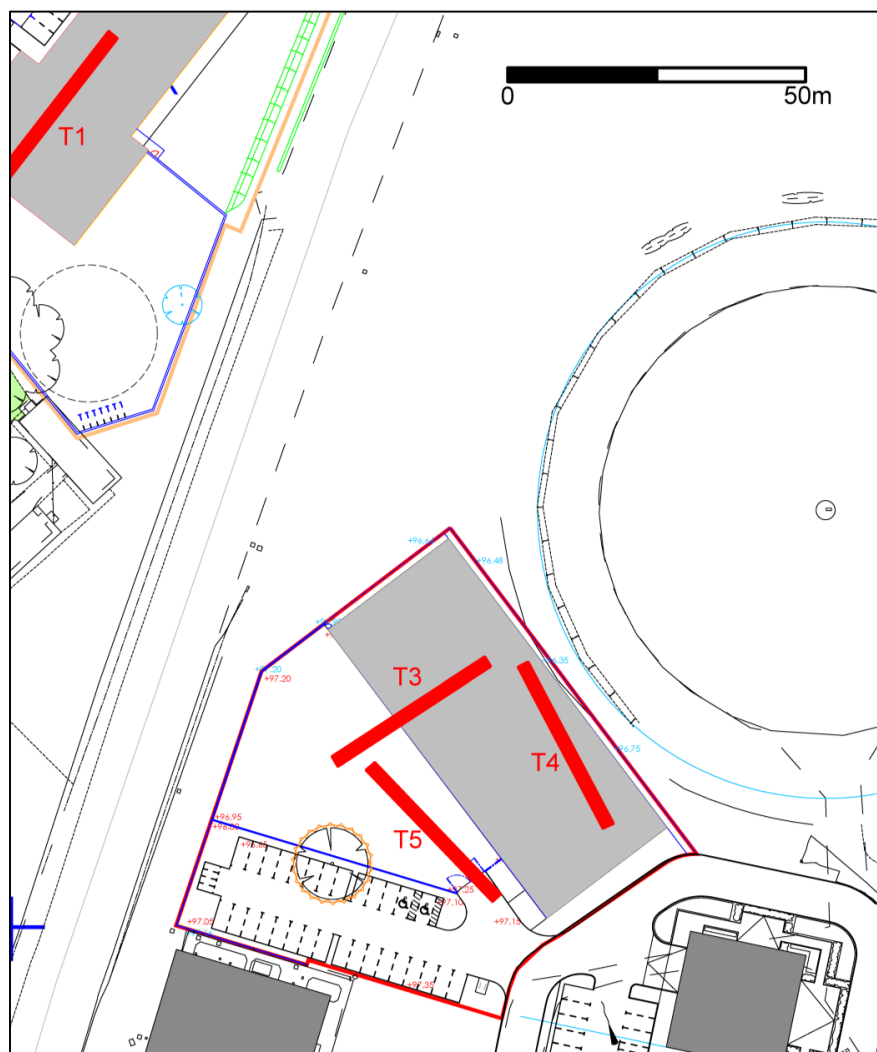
Detail of building footprint with previous evaluation trench locations. Area of strip, map and sample excavation outlines in red.
